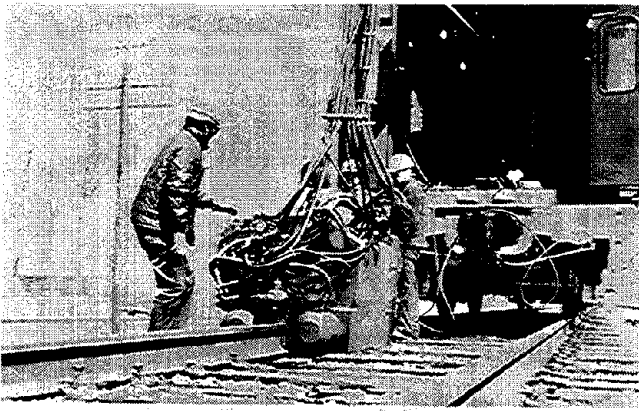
In-track welder working both rails alternately. (Photograph courtesy of AT & SF.)
